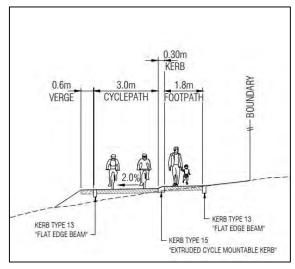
Typical Cross Section of EB4L Walking and Cycling Infrastructure
